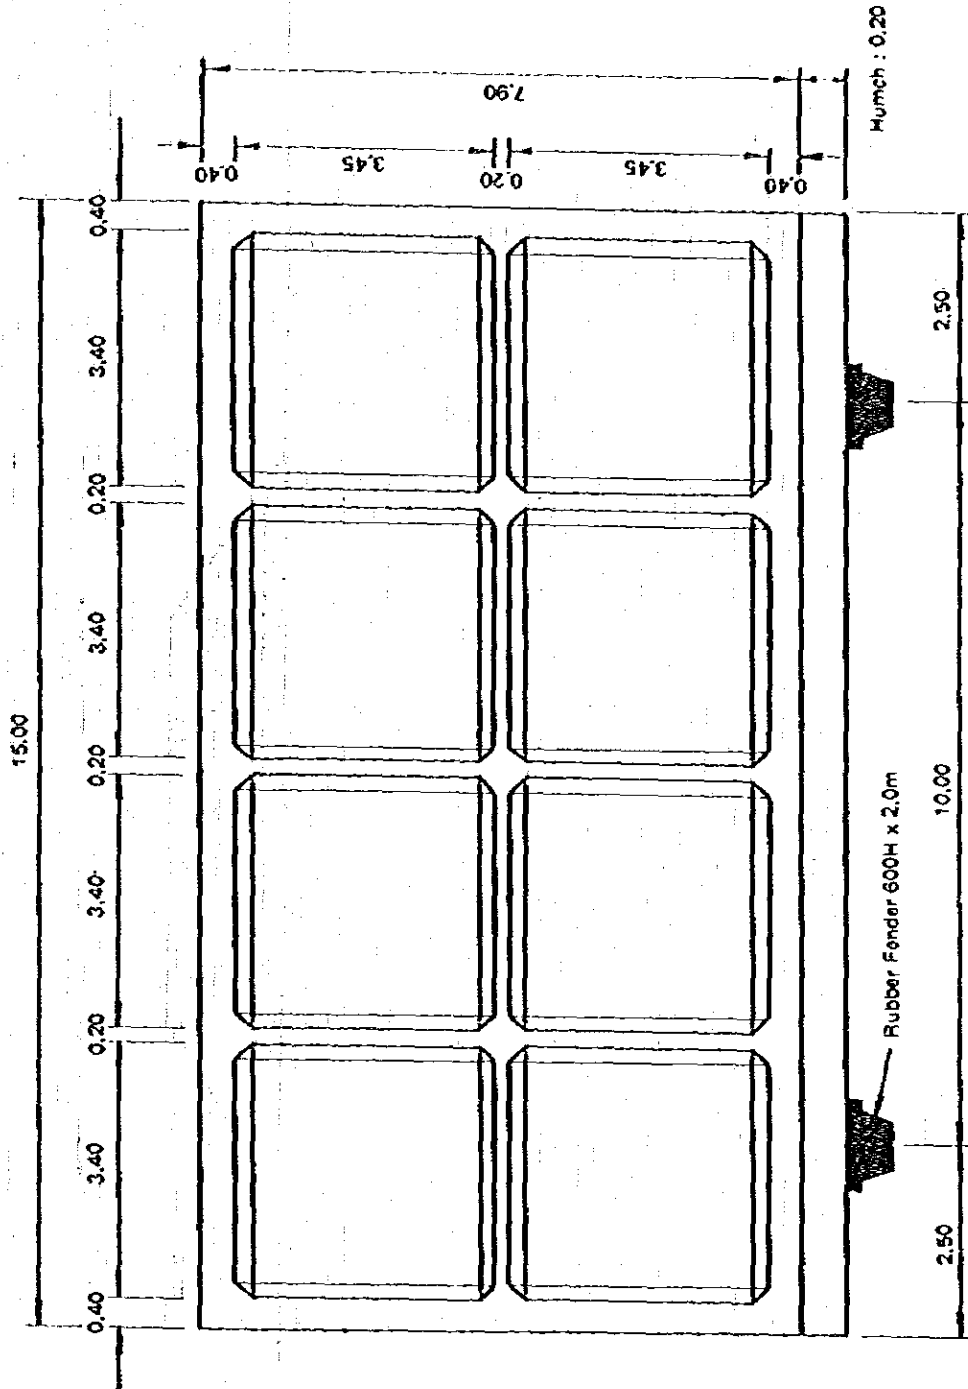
(n) Cross-section of Gravity-Type Caisson Bulkhead (≈10m)
